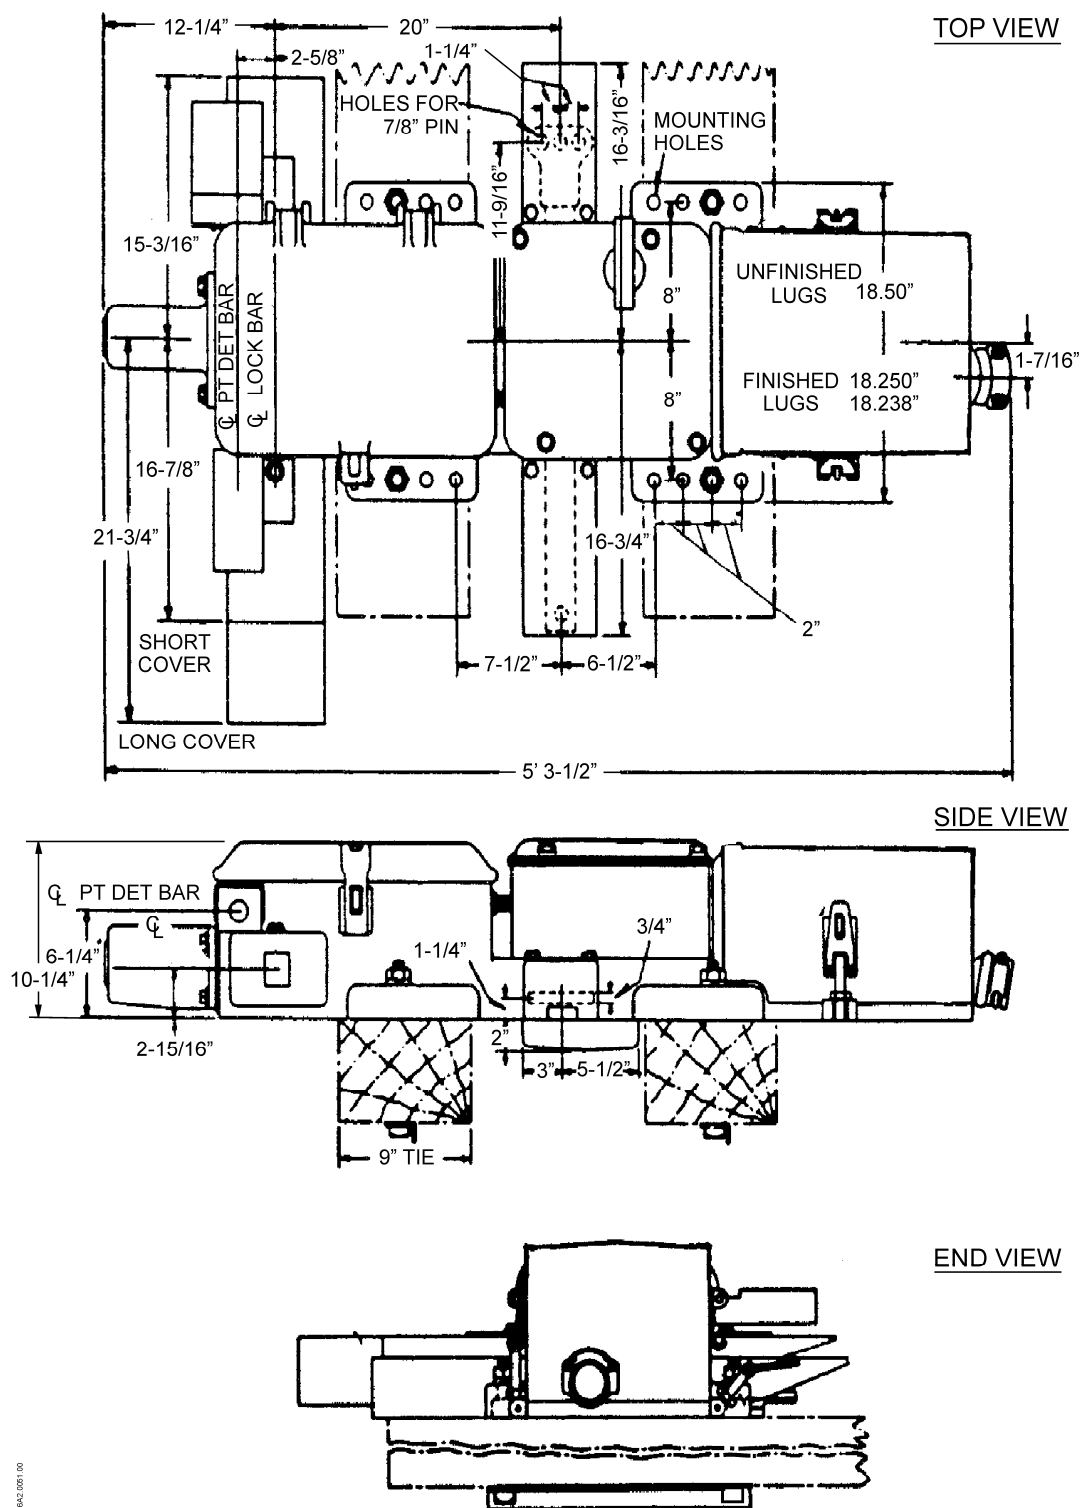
M-3 Switch Machine Typical Mounting Plan
